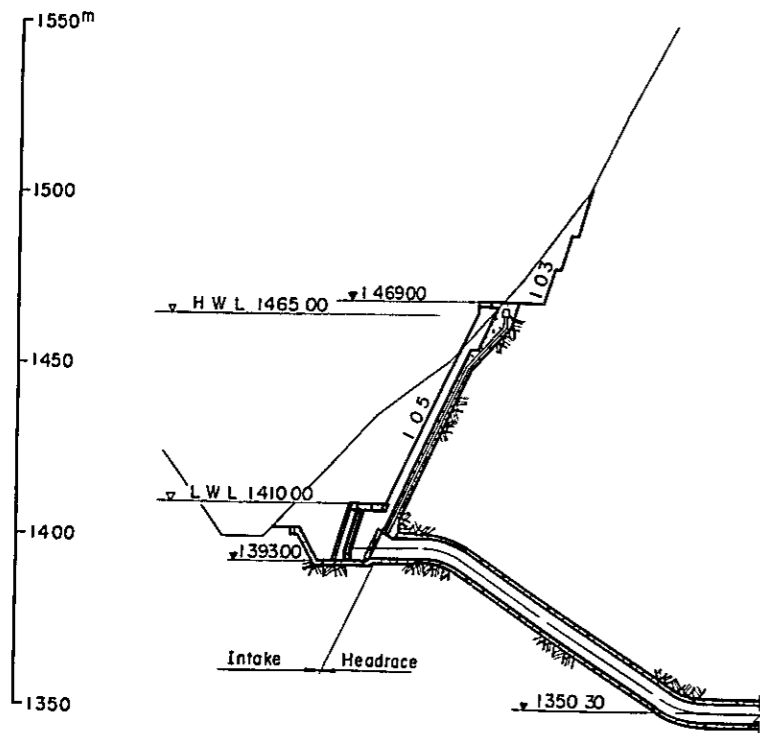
General Plan and Water Conductor (R-2) Longitudinal Profile
